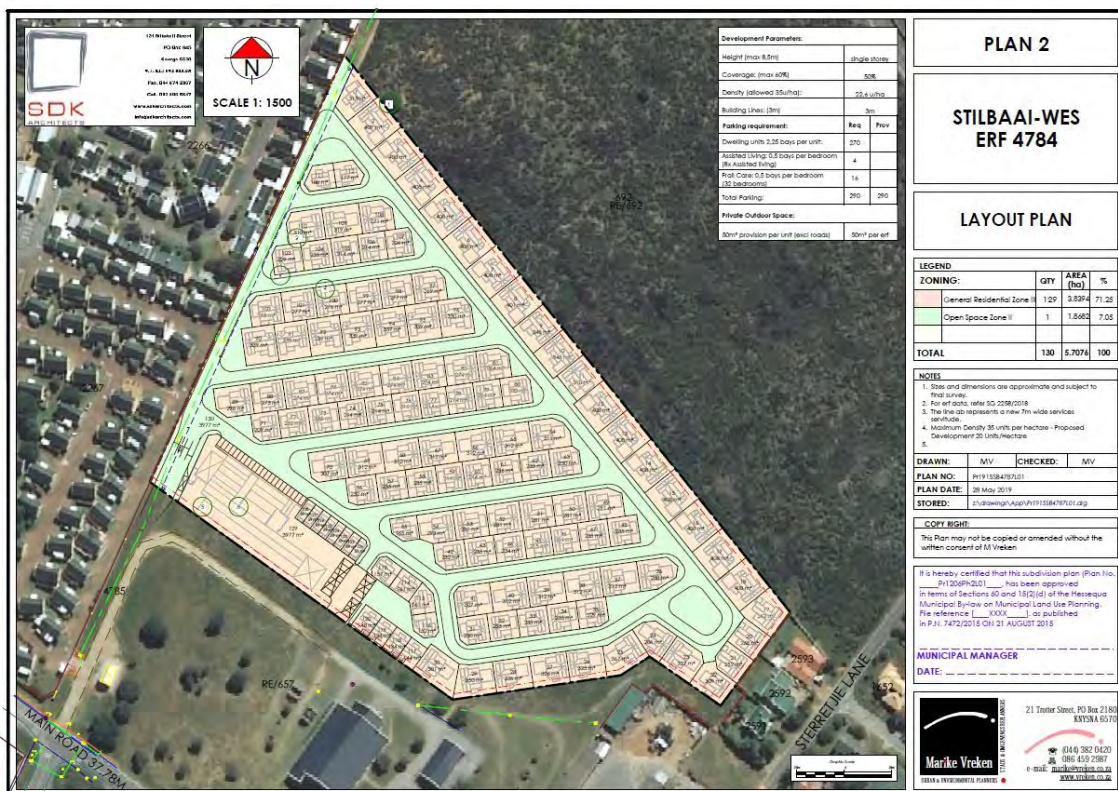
Proposed layout for the Stilbaai Retirement Village.
